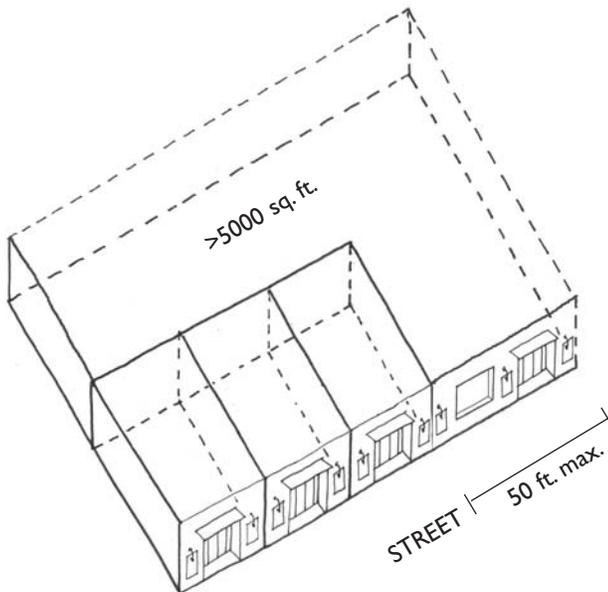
RETAIL FLOOR PLATES AND DESIGN CONTROLS
